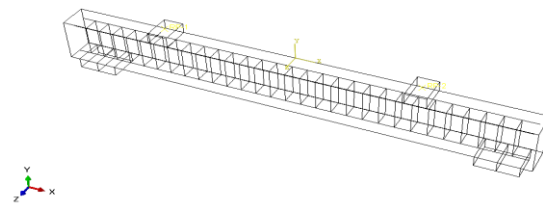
Assembly Drawing of reinforced Concrete Beam Mode
